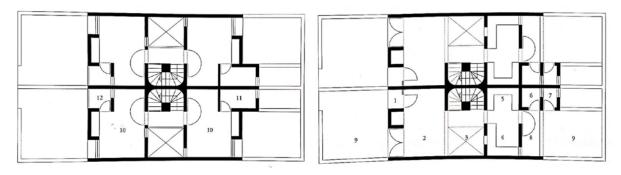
Ground and first floor plan of Staff quarters row houses
